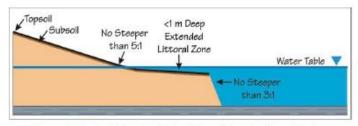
Typical Extended Littoral Zone Shoreline Cross Section
